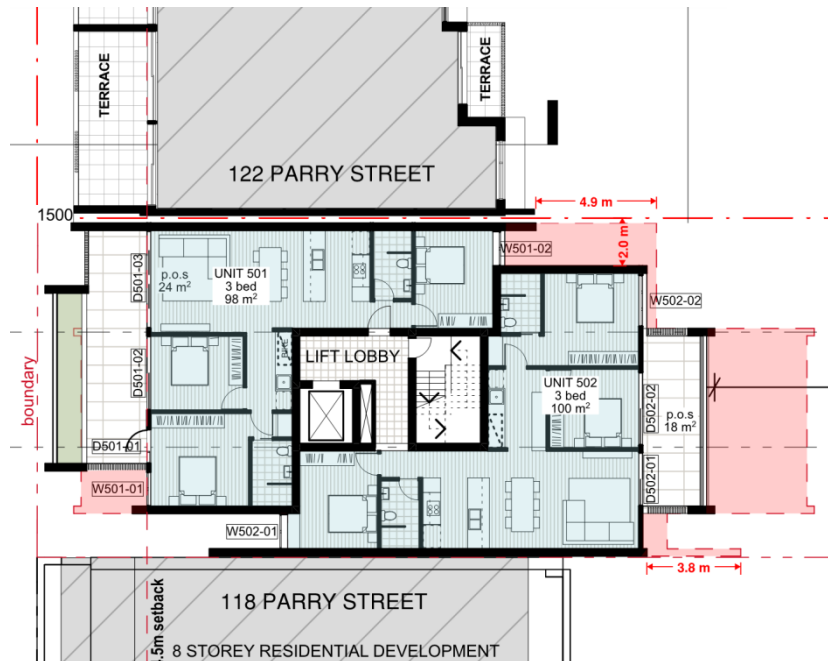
Extract from *Level 5 Floor Plan* (drawing no: DA-106, issue no: 11, dated 14/5/2021) showing reduced blank walls on boundary – extent of building bulk original proposed shown in red.
